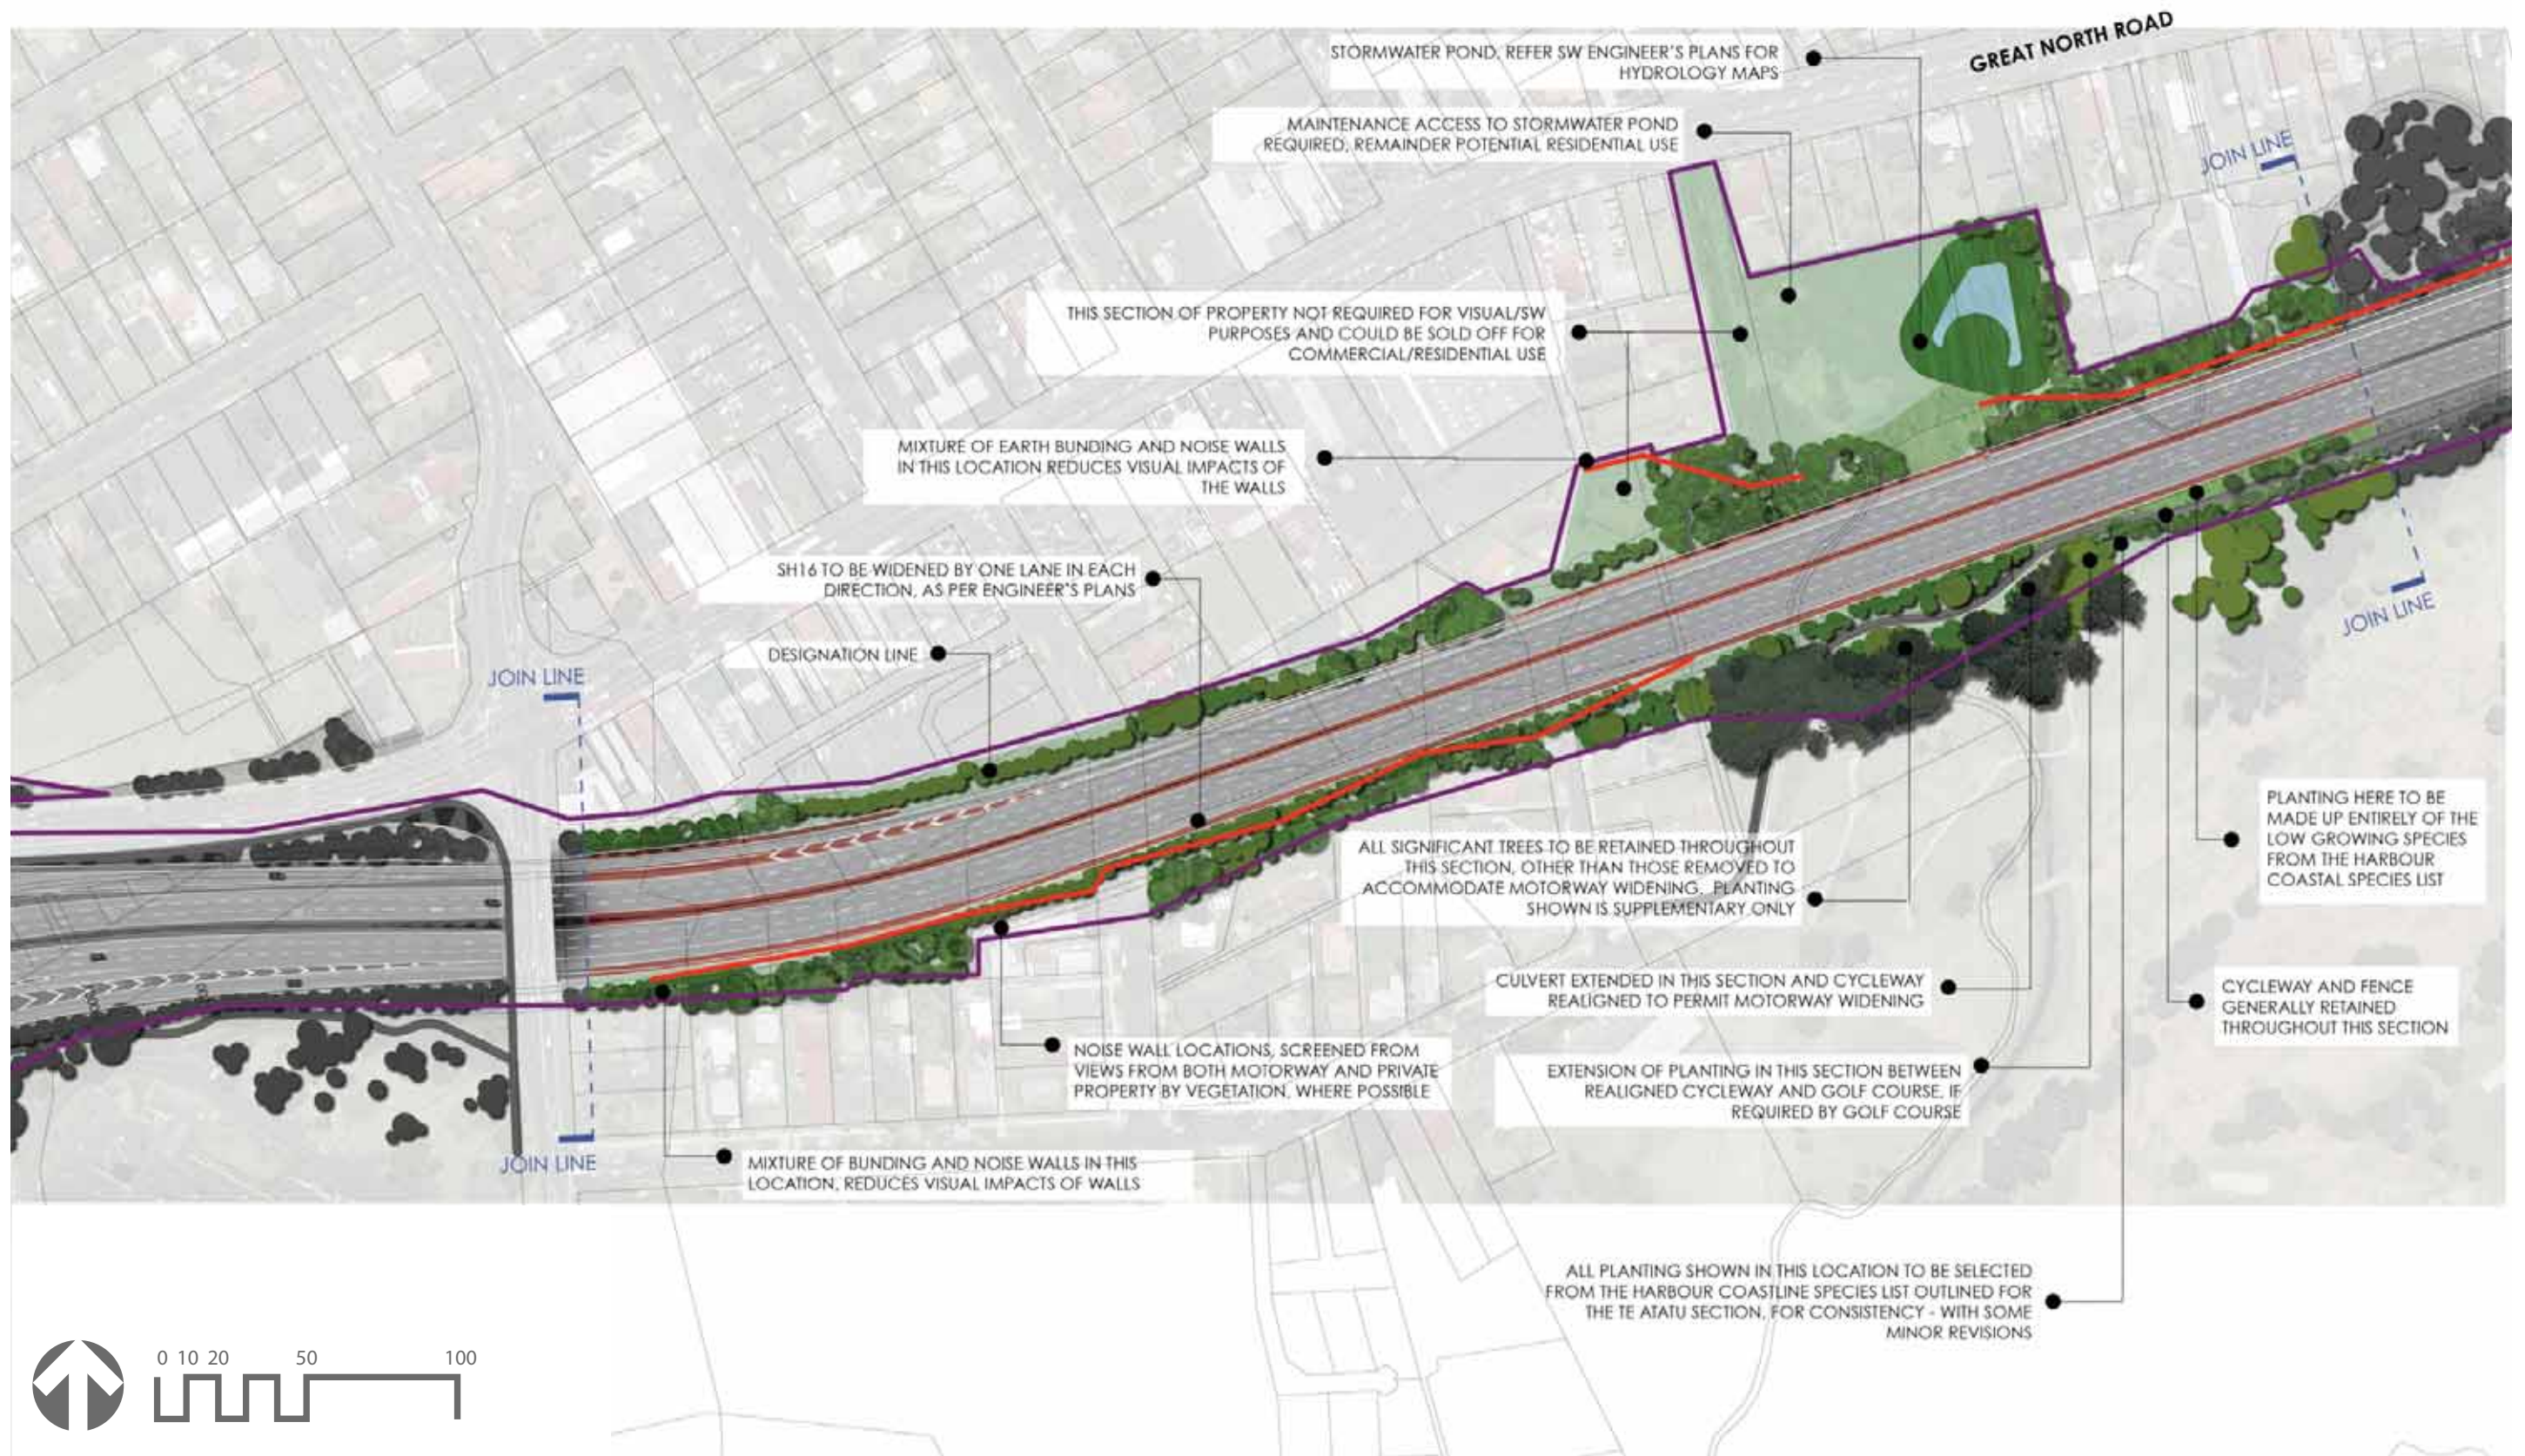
Waterview to St Lukes – concept plan (western section)
